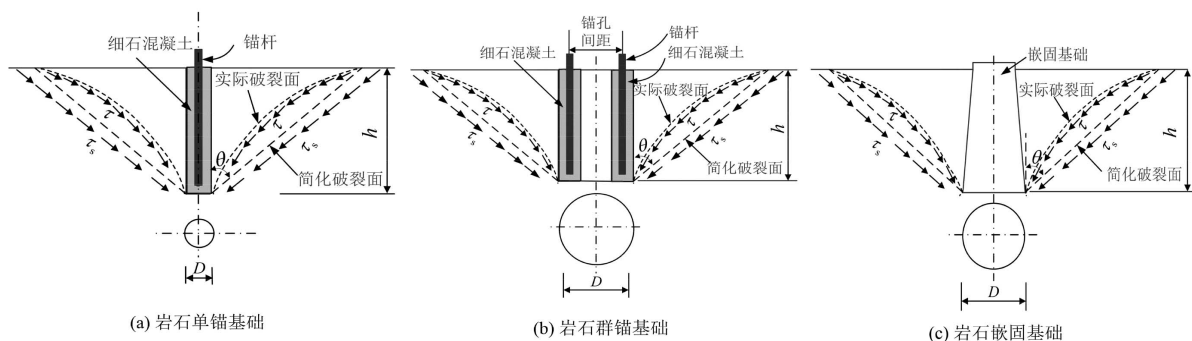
Slipping surface of rock bolt and rock embedded foundations
